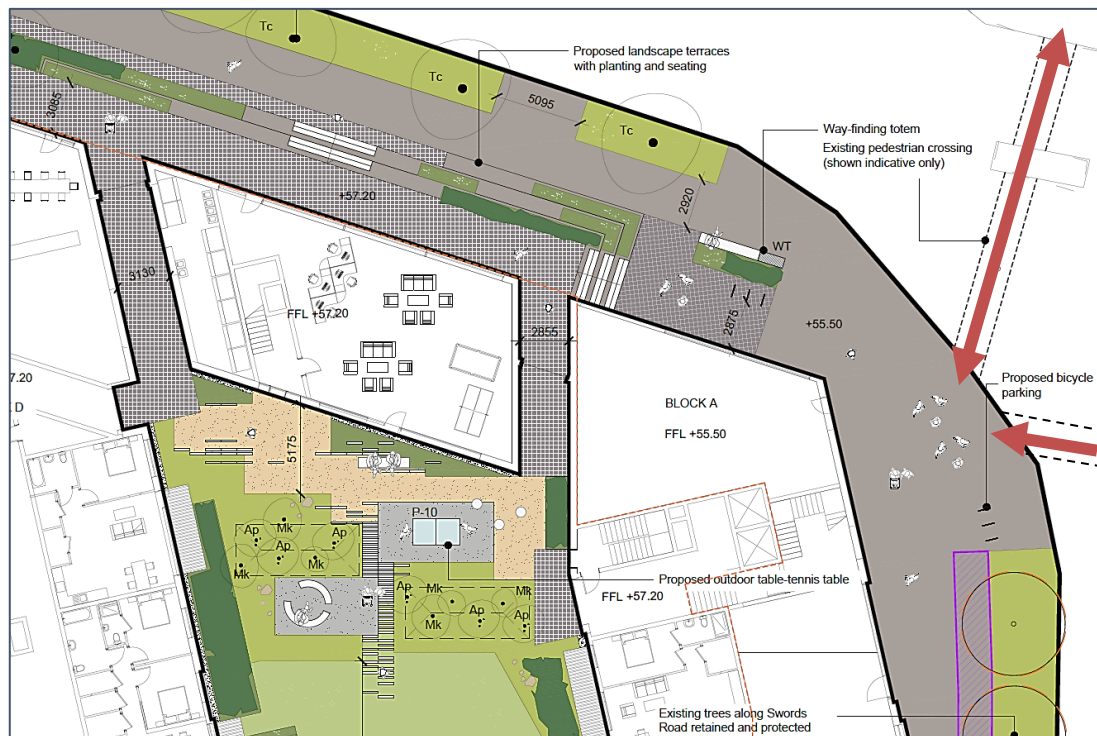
Proposed Landscaping and Footpath to the North-East of Subject Site
